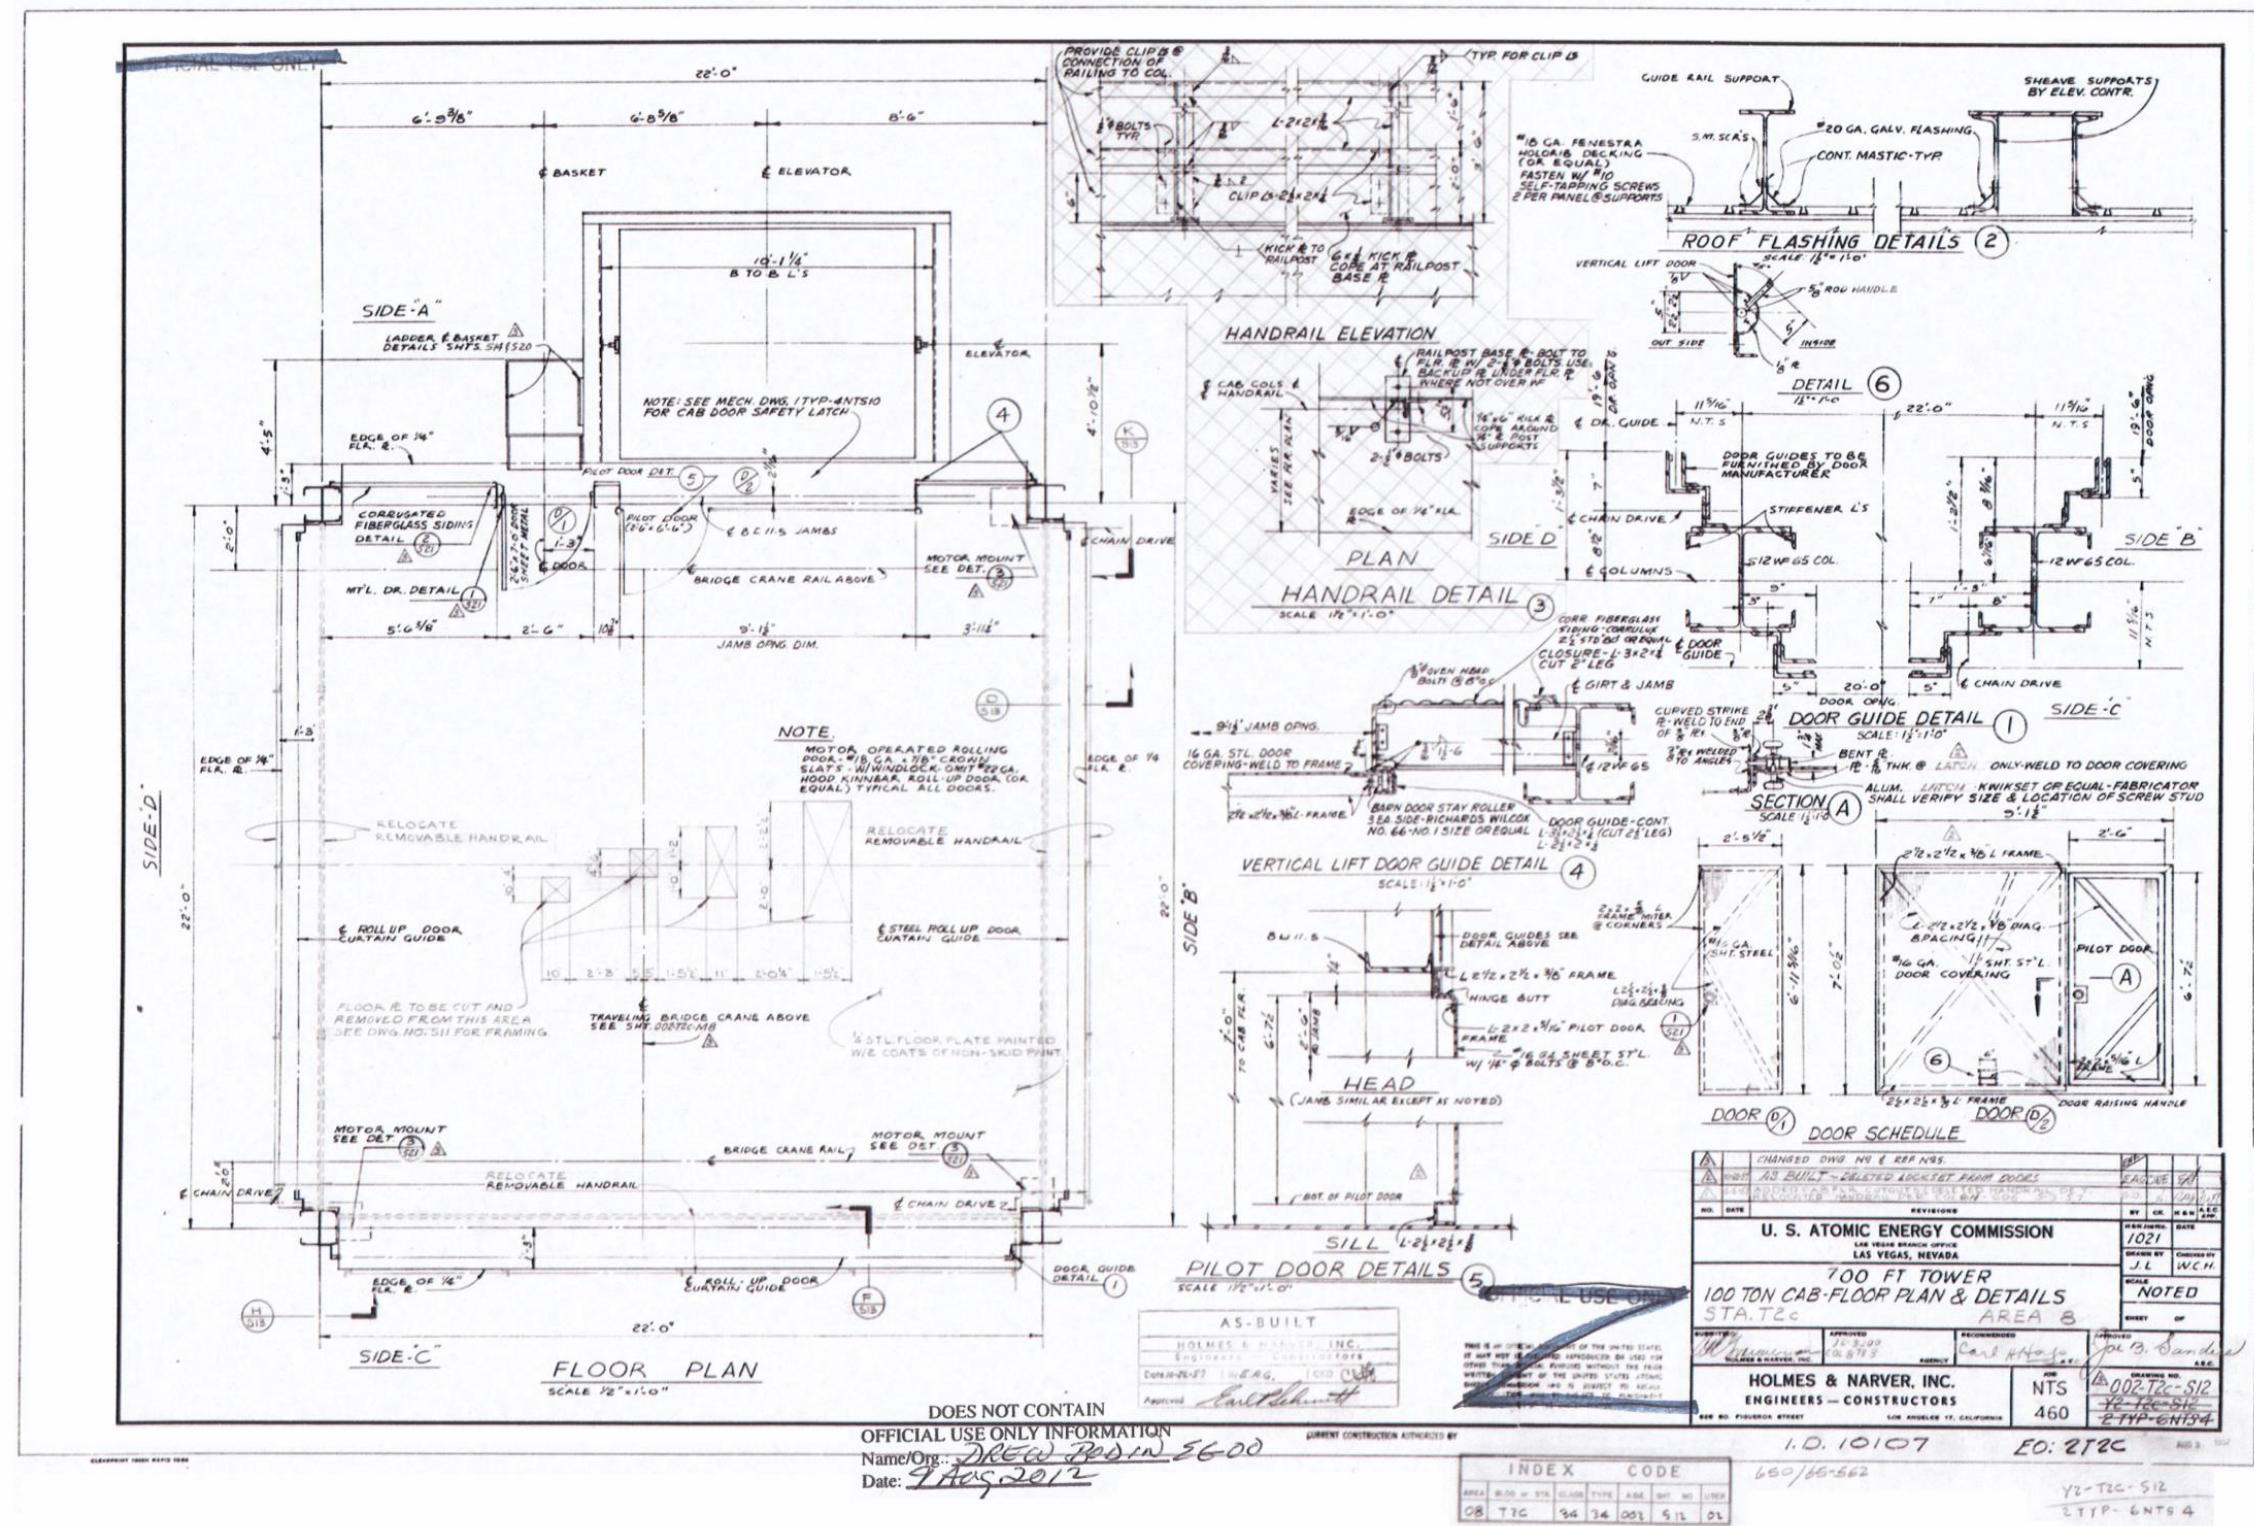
Smoky 700 ft tower 100 ton cab floor plan and details.
